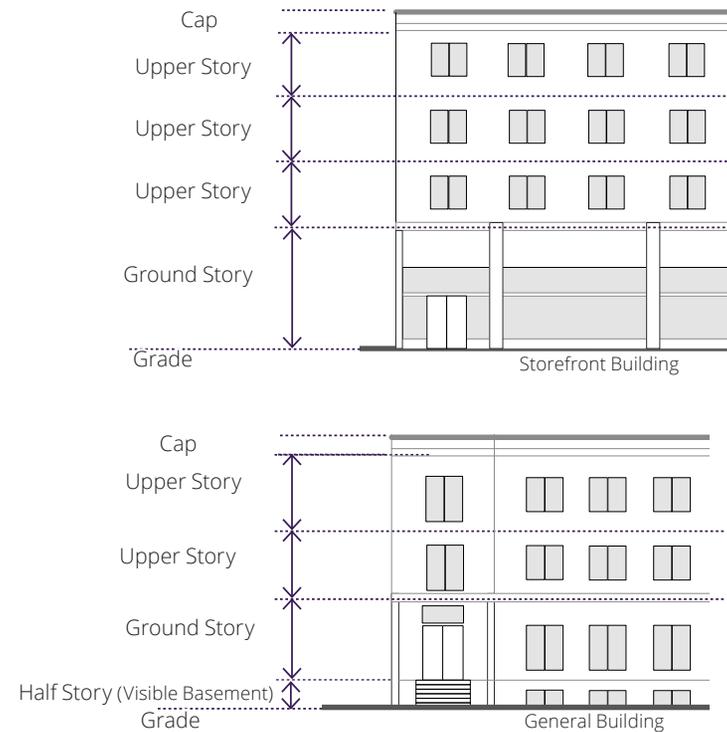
D-26. Measuring Stories with Floor-to-Floor Height
